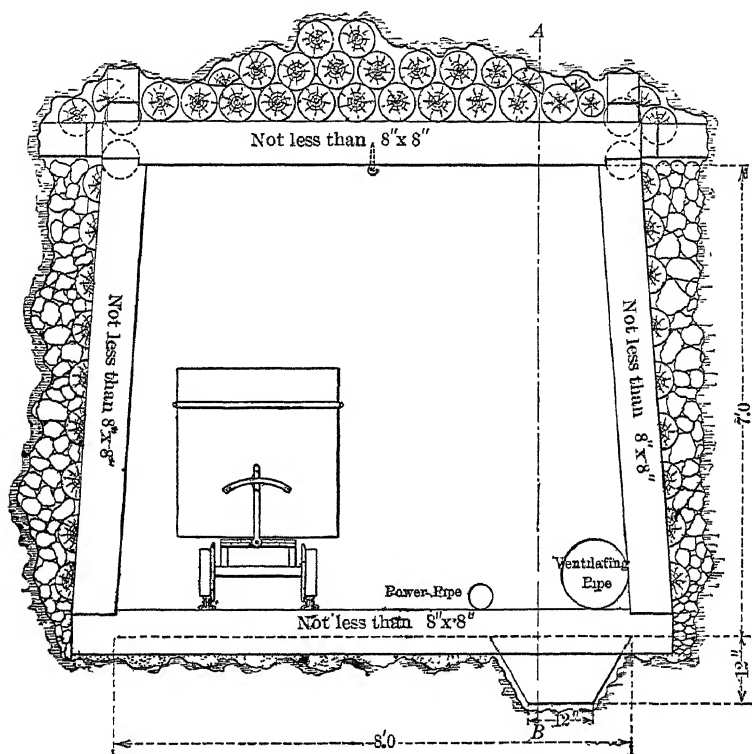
CROSS-SECTION OF TUNNEL, SHOWING ARRANGEMENT OF TRACK, DITCH, AND PIPES.
